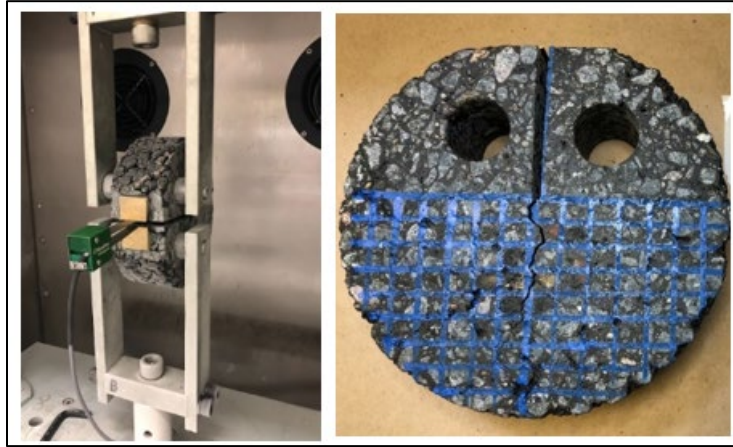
DC(T) Test Loading Fixture (Left) After Test (Right)
